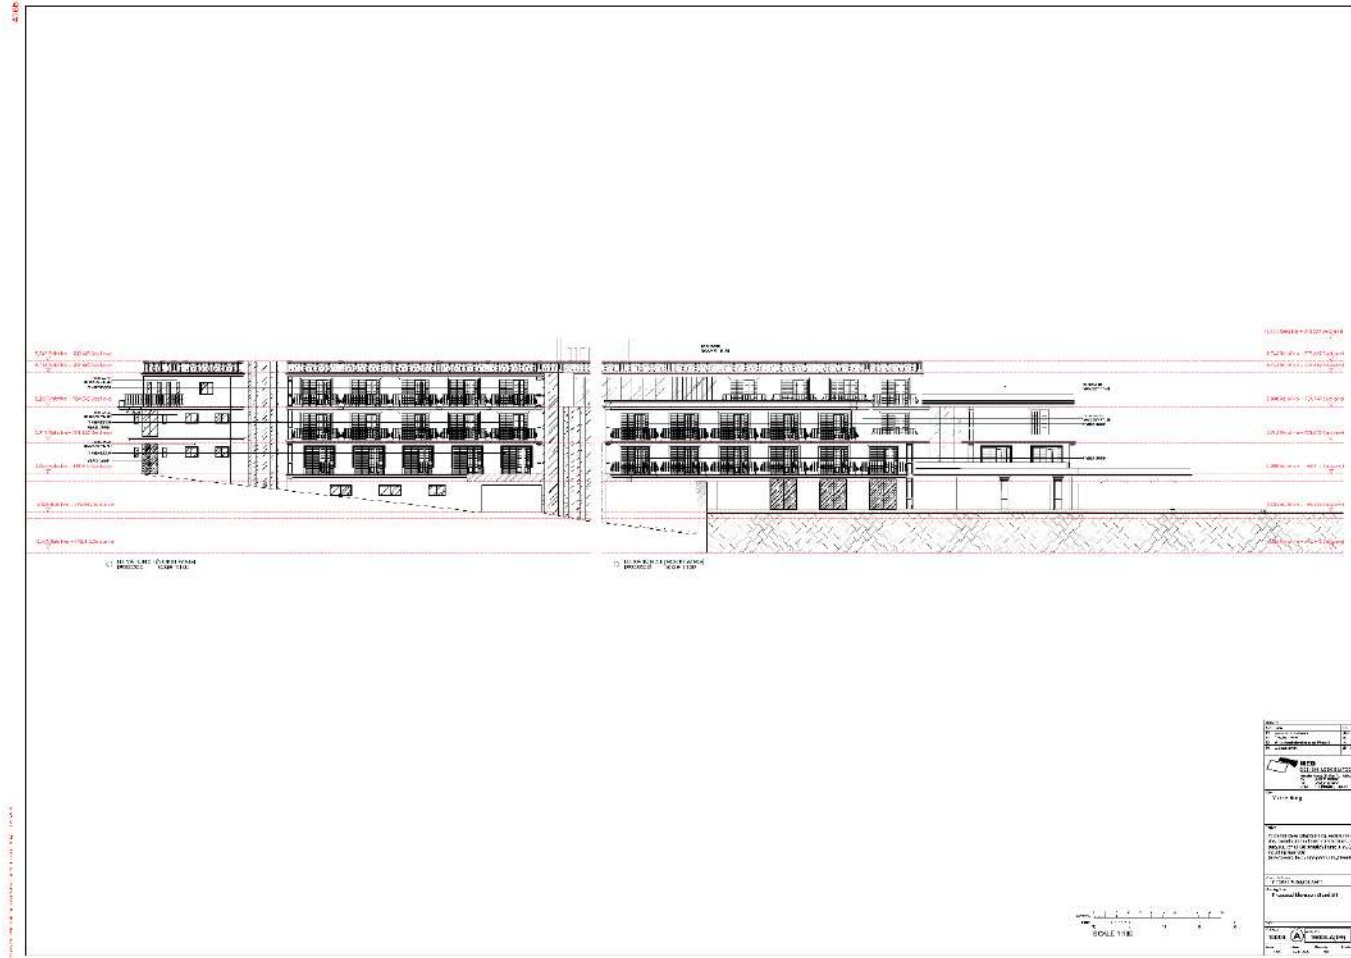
PROPOSED ELEVATION 3I AND 3II NORTH WING
